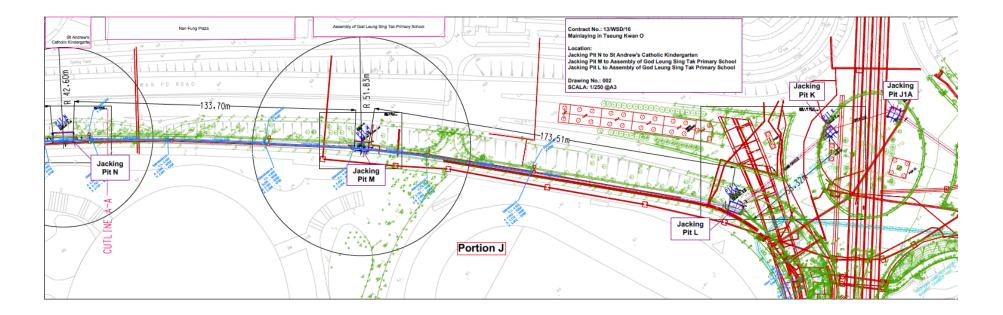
Location Plan for Portion J – Pit L-M-N, K, J1A
